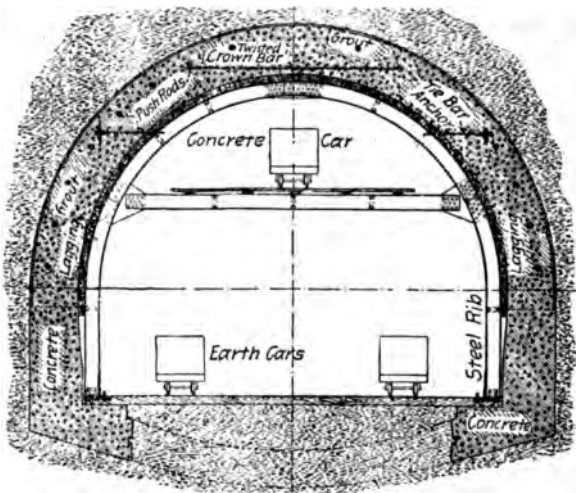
Section of East Boston Tunnel, Showing Reinforcement and Forms.
